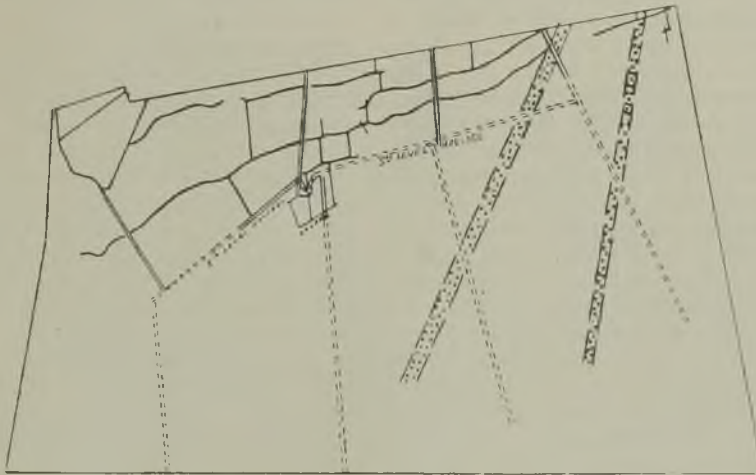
PLAN OF EAST GEDULD MINE, EXISTING HAULAGES BEING SHOWN THUS ——— AND PROPOSED HAULAGES - - - - .
